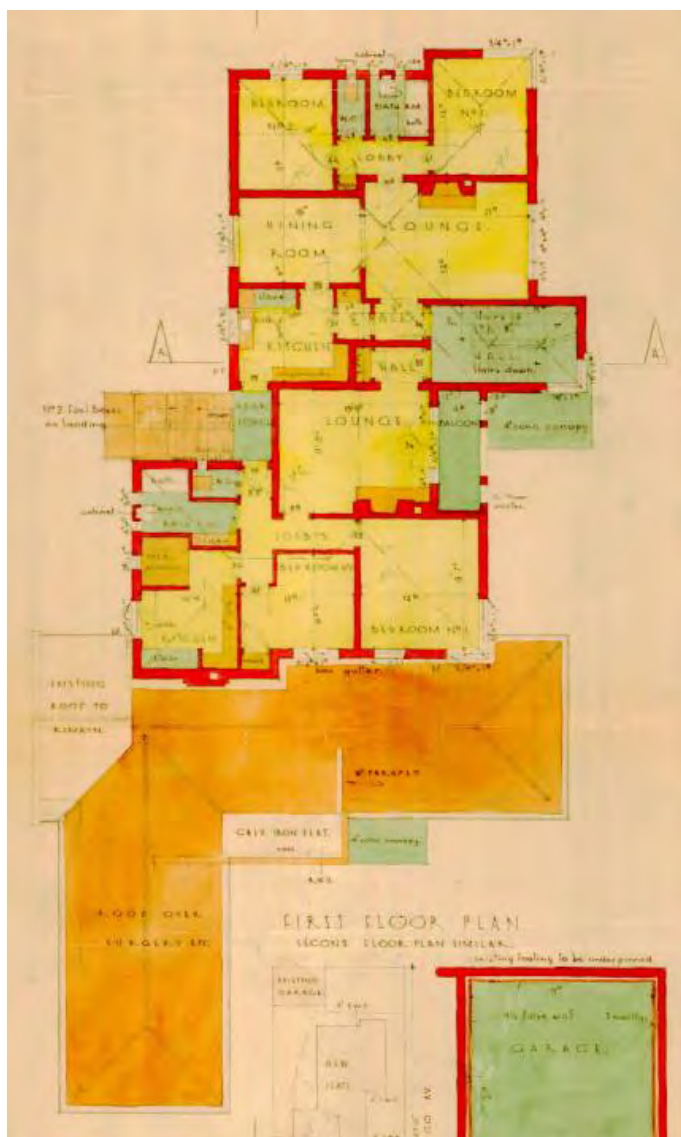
Alteration, addition & conversion to block of 3 storey flats, corner of Ormond Road & Bendigo Avenue, for Mr S. G. L. Catchlove (first & second floor plan). Source: Architects R. M. & M. H. King. 1938. Drawings of 38 Ormond Road, Elwood. Council Records. City of Port Phillip.
